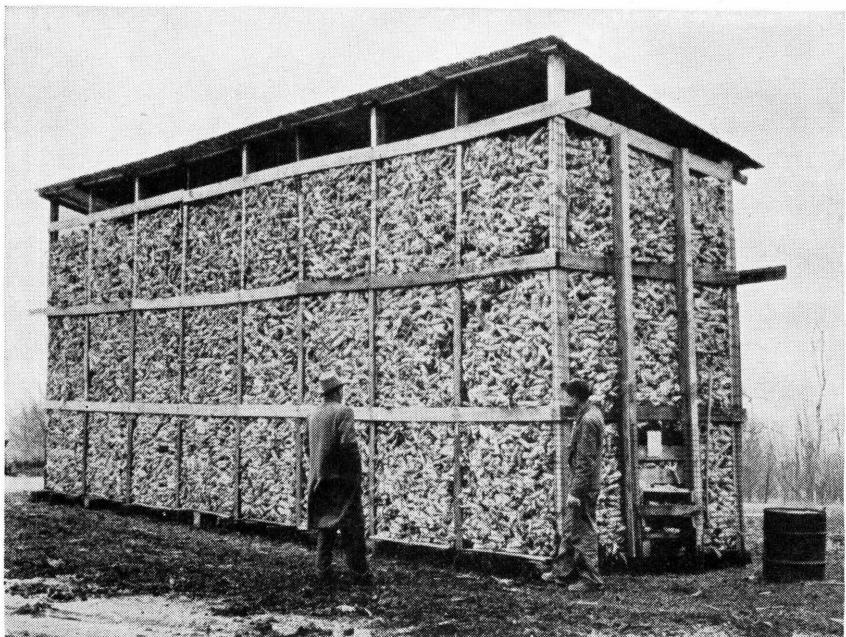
Semipermanent rectangular cribs can be built at relatively low cost. Although simply constructed, this crib is well exposed to wind, has a good roof, and the floor is set above the ground. Crib should be braced against wind when empty.
